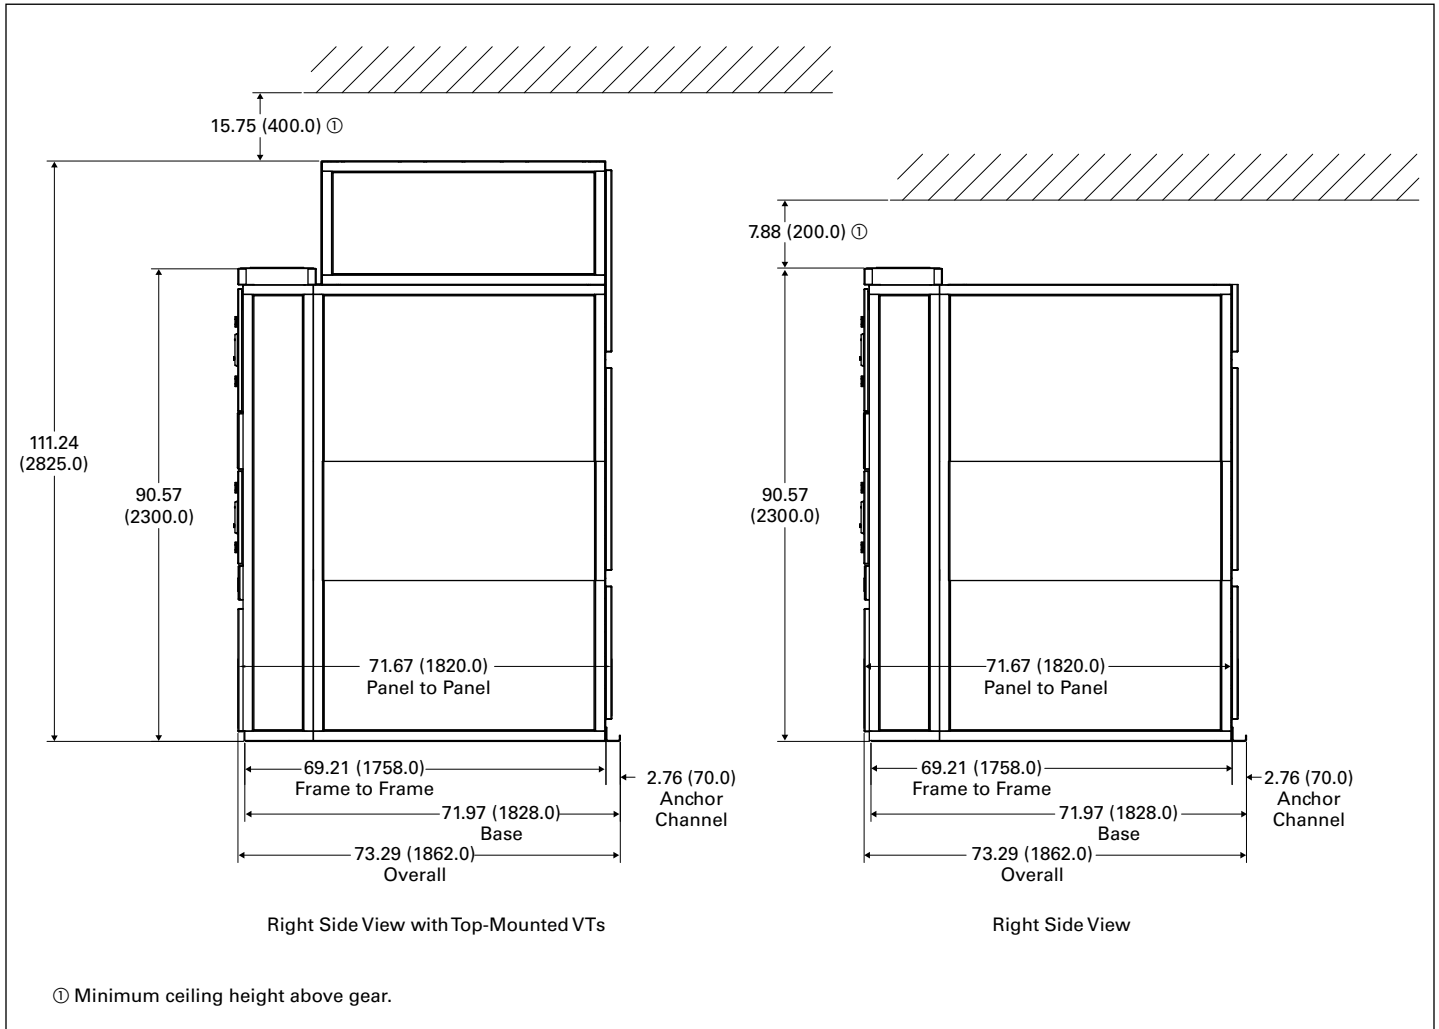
Typical Side Views—Dimensions in Inches (mm)
